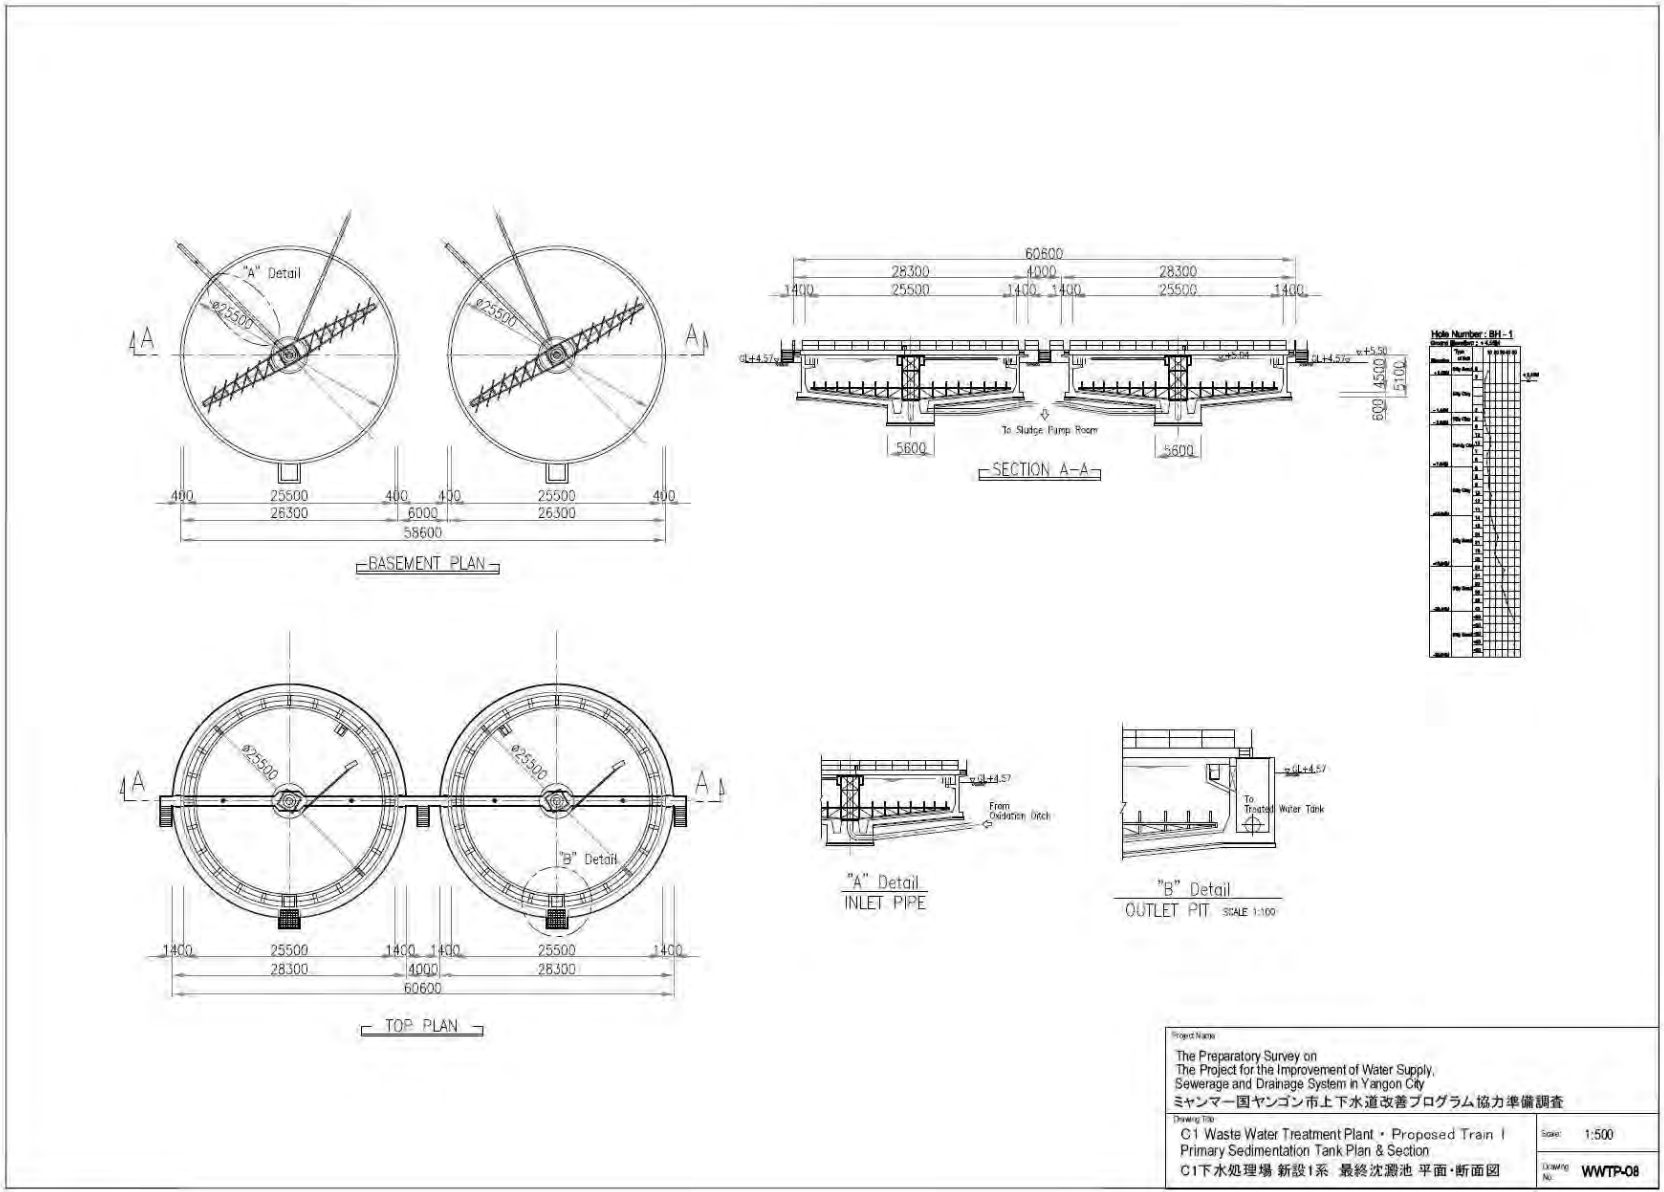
Final Sedimentation Tank, Plan & Section (New Construction of Existing Line)
